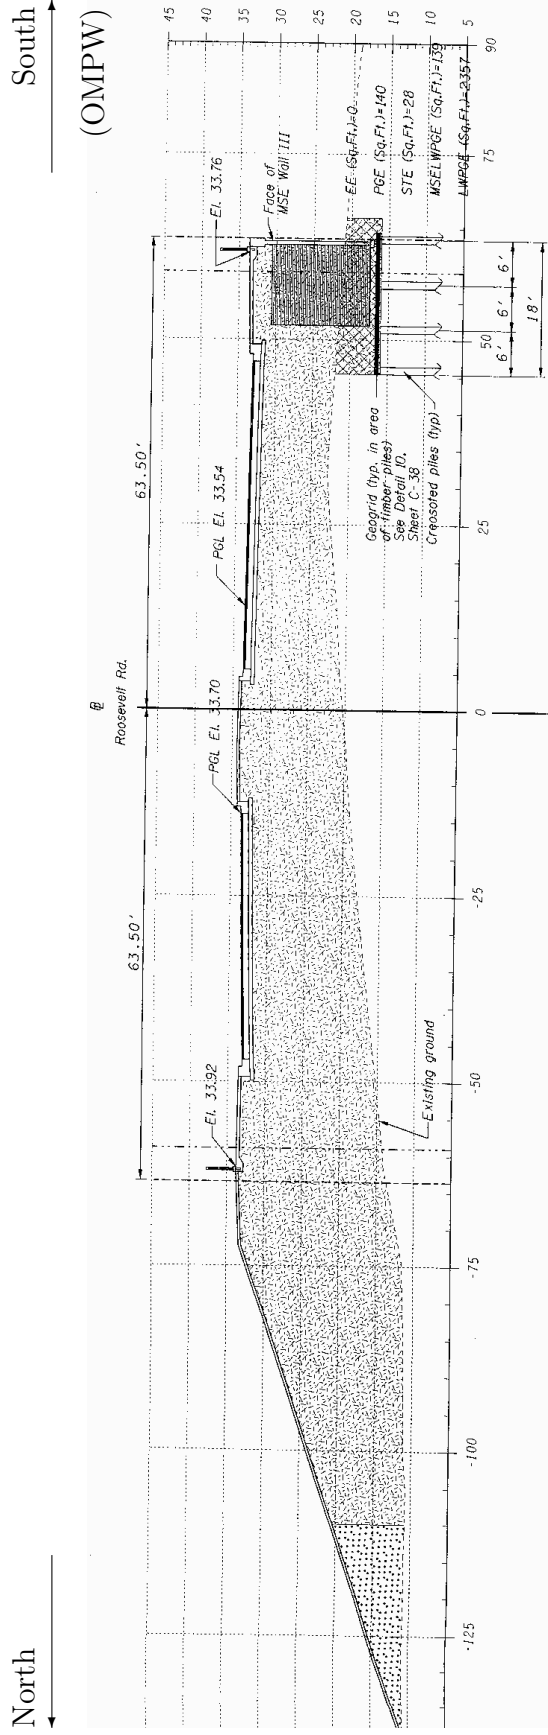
Roosevelt approach embankment. Cross section looking East. (Dimensions in feet)
